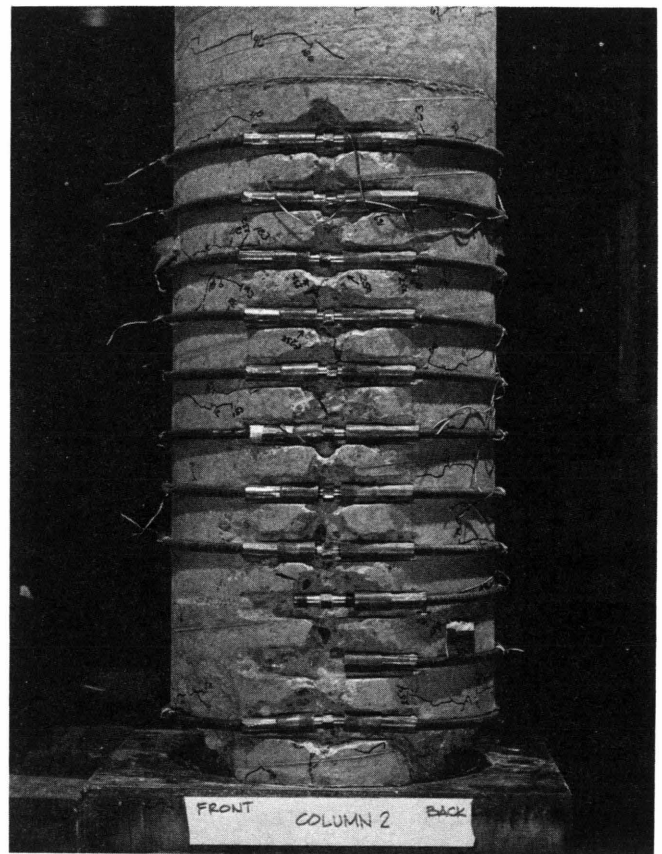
Column 2 elevation at completion of test: notice that damage is all located below bottom exterior hoop; hoops were undamaged; bottom hoops were removed at completion of testing.
